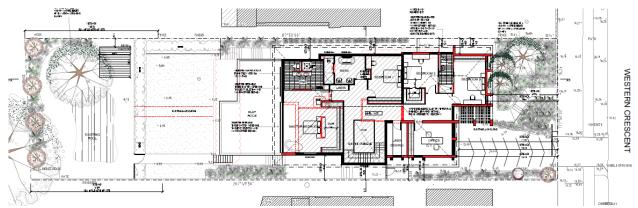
Proposed First Floor Plan (existing walls shown in black and proposed in red)
